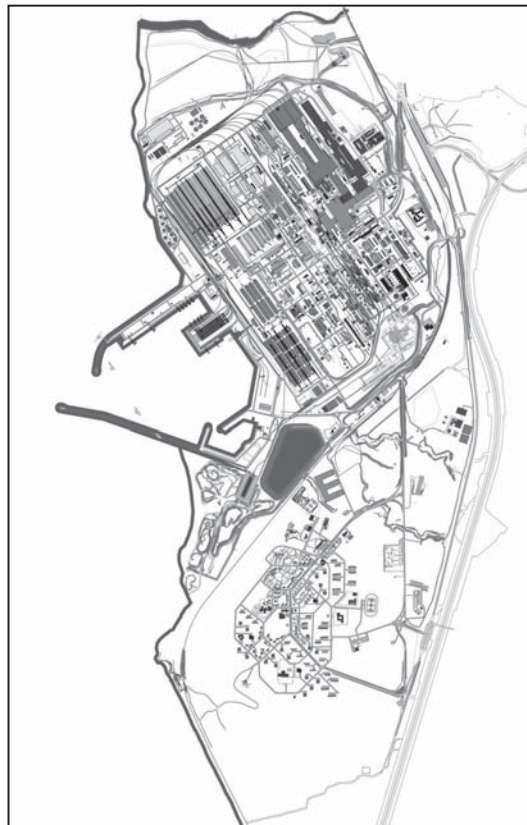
Factory campus Plan layout (Source: İSDEMİR archive 2012 and revised by author)
